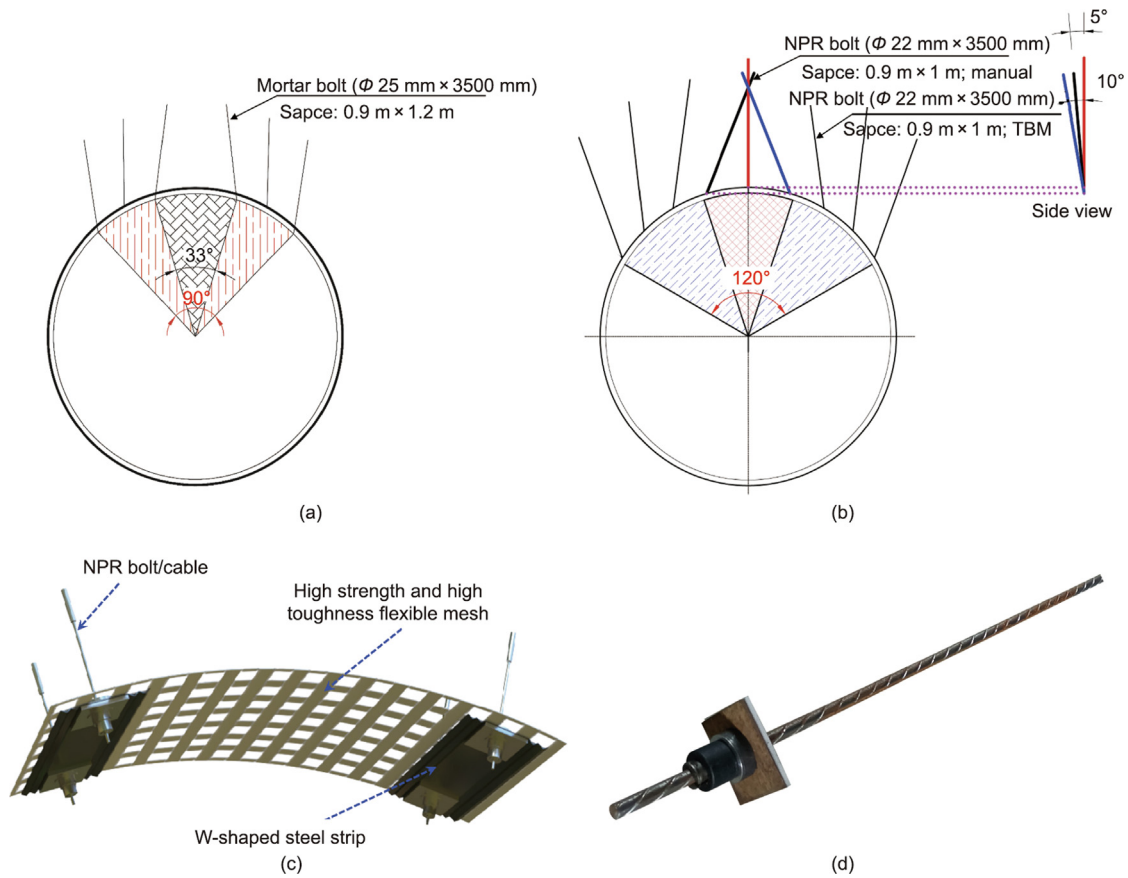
Improvement of bolt support scheme. (a) Original bolt layout scheme; (b) NPR bolt layout scheme; (c) 3D NPR active support system; (d) NPR bolt used in the field.
